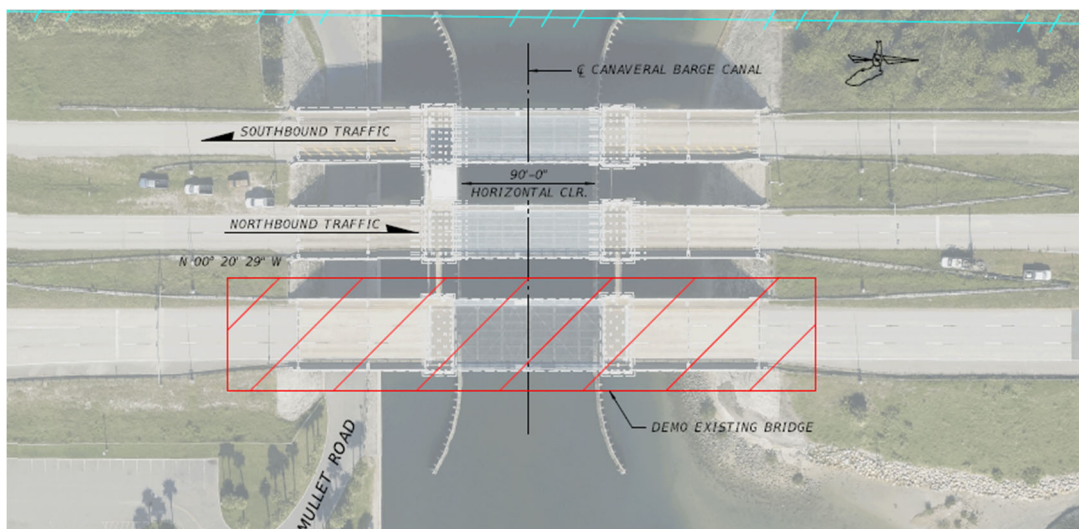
Traffic Control Plan Phase II-Demo Existing NB Bridge
